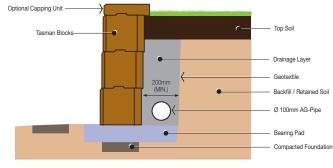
Tasman Straight Gravity Retaining Walls up to 660mm High
